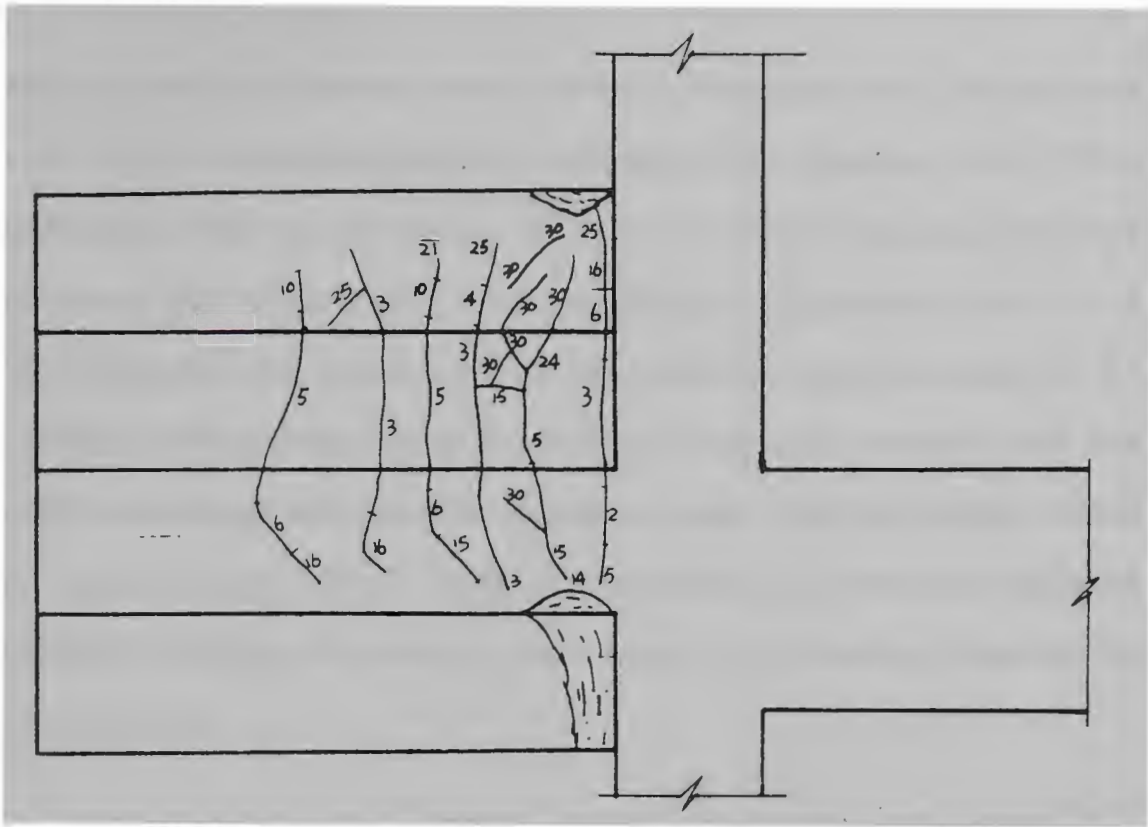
Crack Pattern for Specimen RPA1
